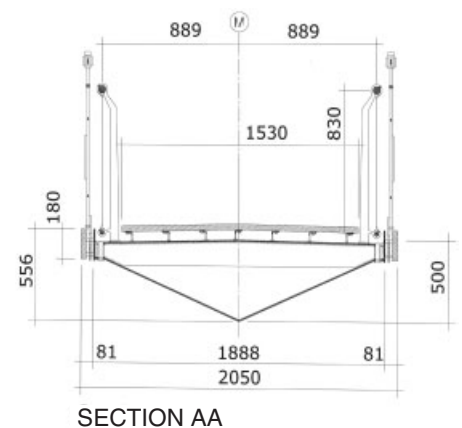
Section through the new steel box girder and historic suspension bridge [10]
